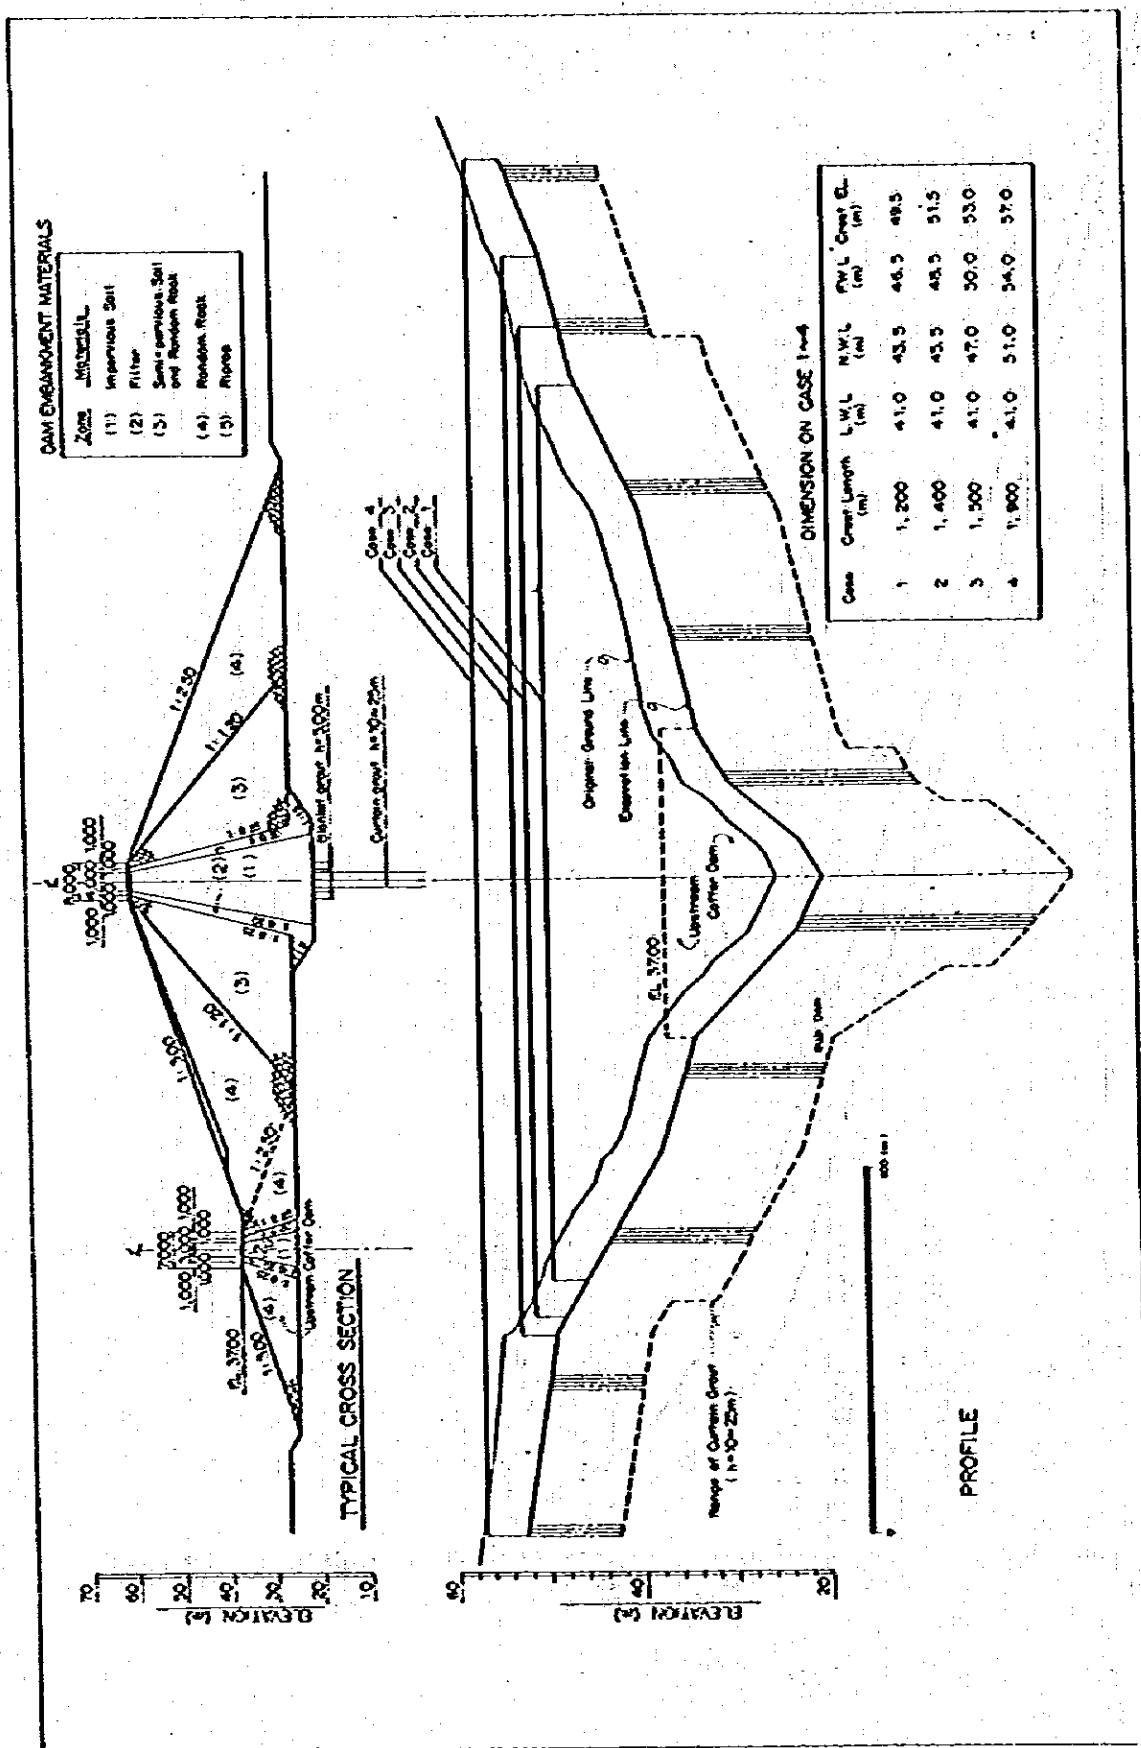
TYPICAL CROSS SECTION AND PROFILE OF ALTERNATIVE BILLA DAM
